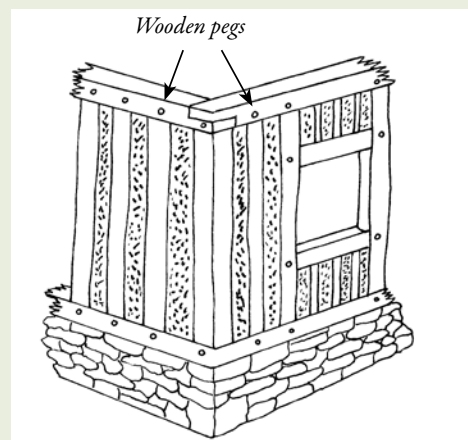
French colonial buildings were constructed using both the poteaux en terre (above) and poteaux sur sole (right) methods.
